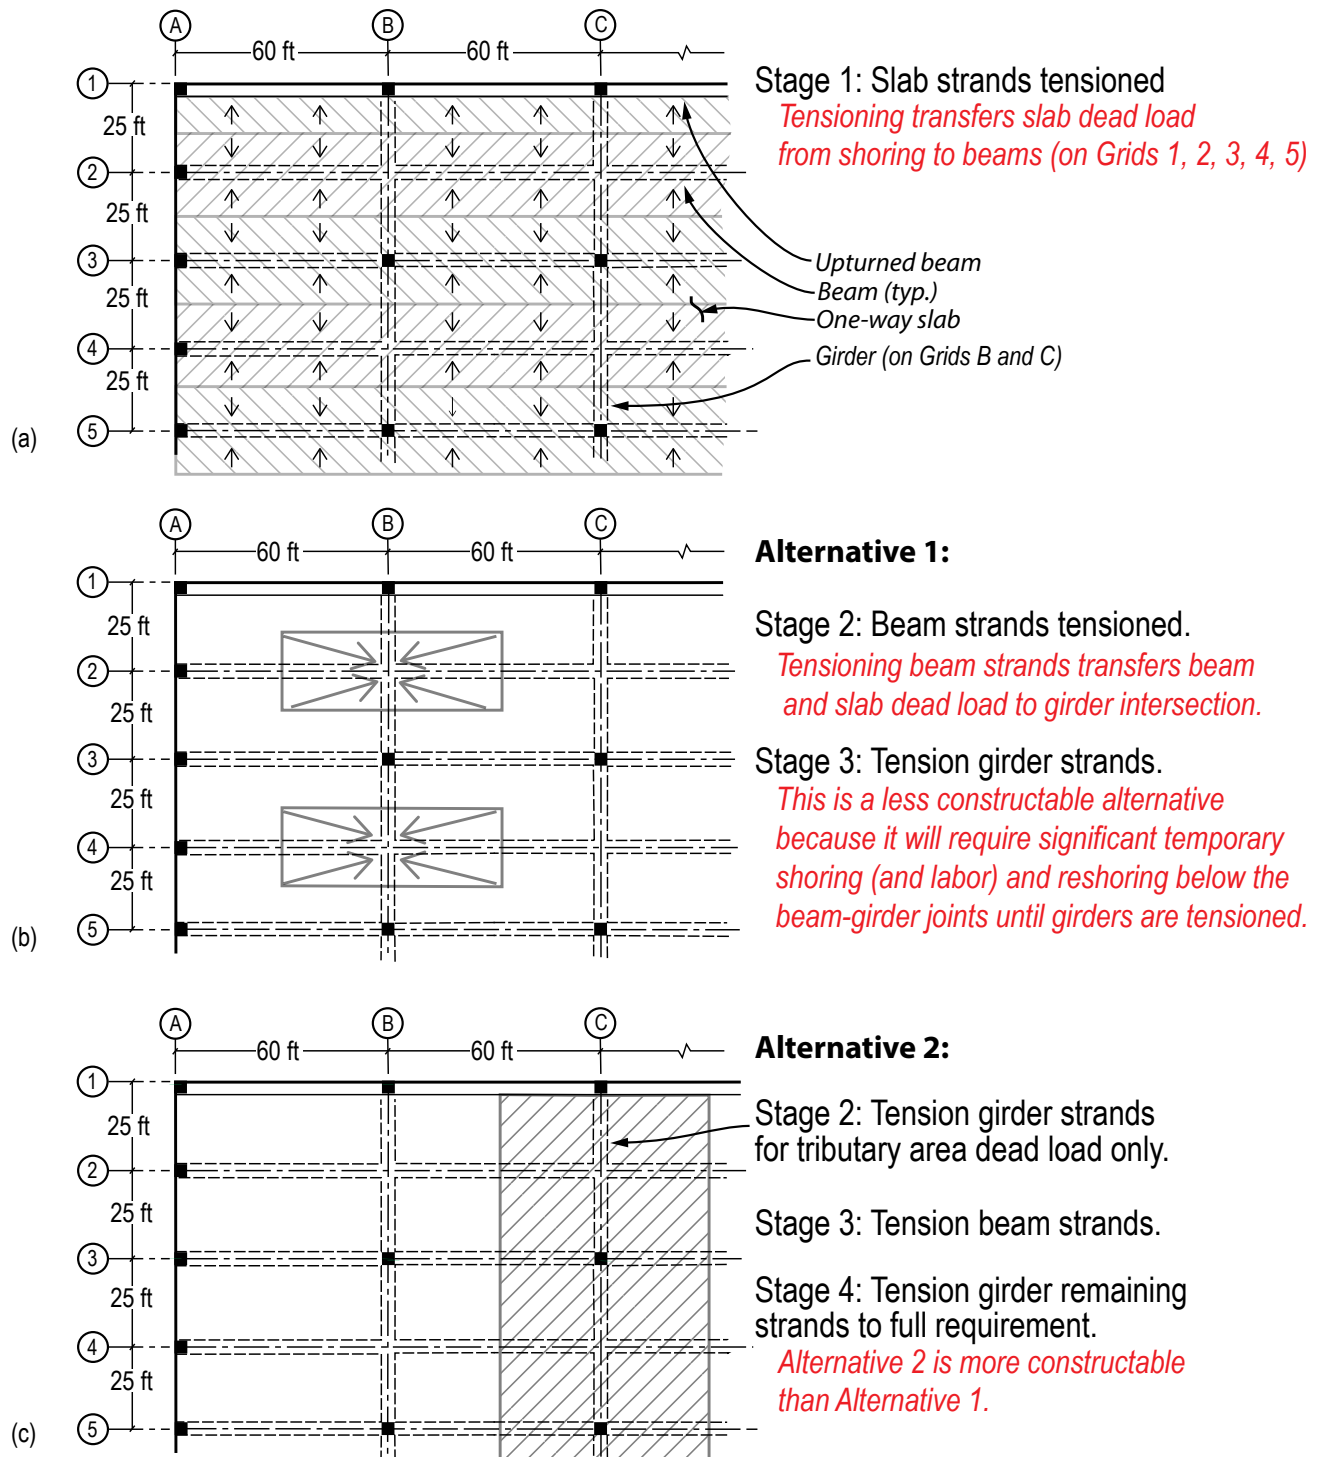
An example of stage post-tensioning: (a) Stage 1, tensioning of strands in the slab will unload the shores under the slab and add to the shoring loads under the beams; (b) if beam strands are tensioned in Stage 2, the slab and beam loads will be transferred to supporting girders, thus adding significantly to the shoring loads at the intersections of beams and girders; and (c) if instead the girder strands are tensioned in Stage 2, the high local shoring loads at the beam intersections can be avoided. For additional information, refer to “[Reshoring and Early-Age Building Behavior](#),” an on-demand course available through ACI University.
